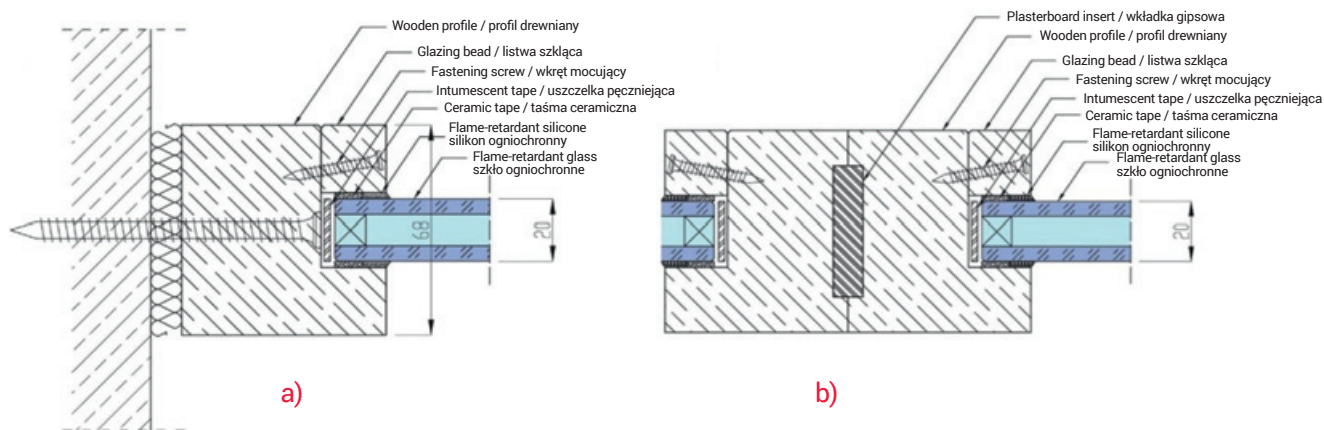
Cross-section of external (a) and internal (b) wooden construction connections
